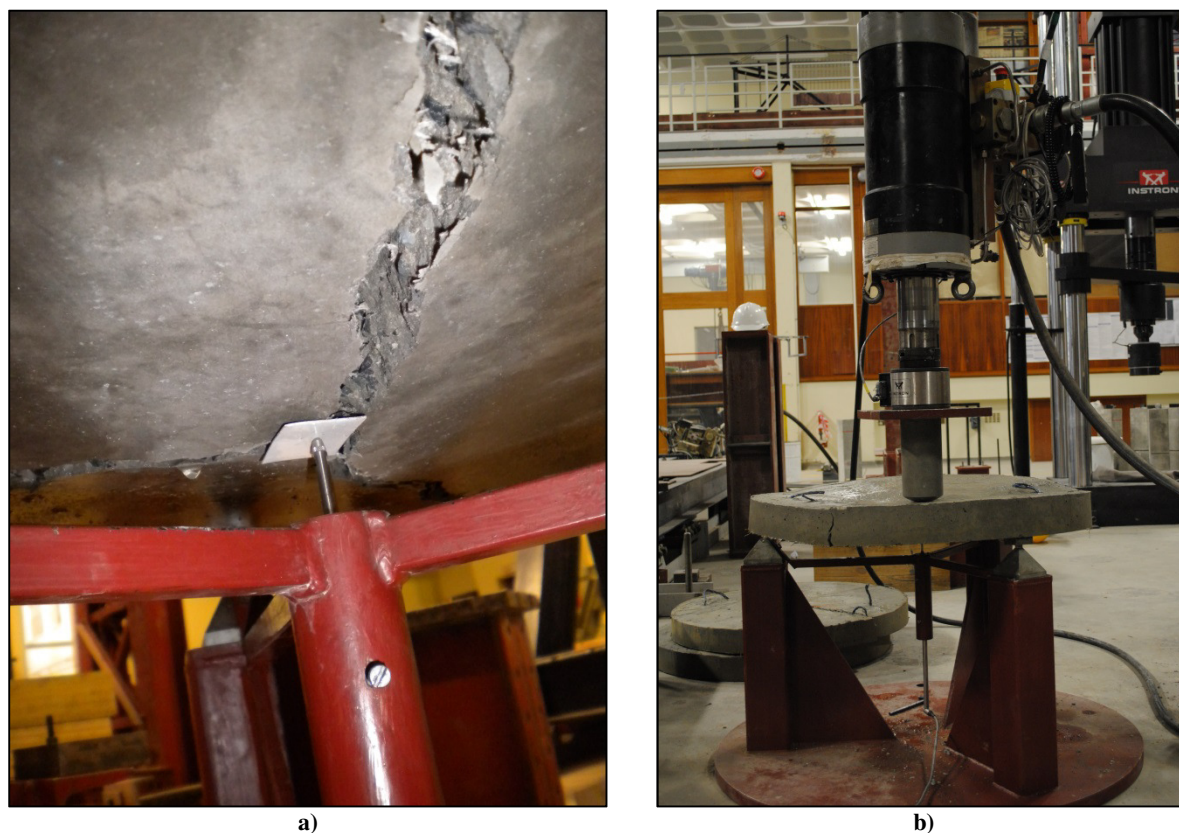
Steel plate restricting LVDT slip (a) and RDP test setup (b)
